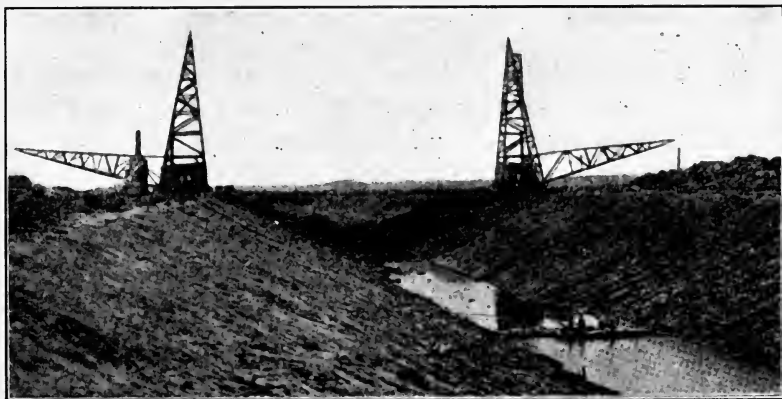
Double tower excavator. (*Courtesy of Engineering & Contracting.*)
